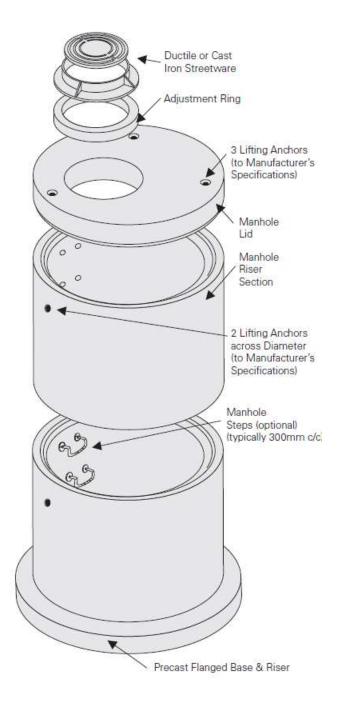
Schematic Diagram of Precast Manhole General arrangement
